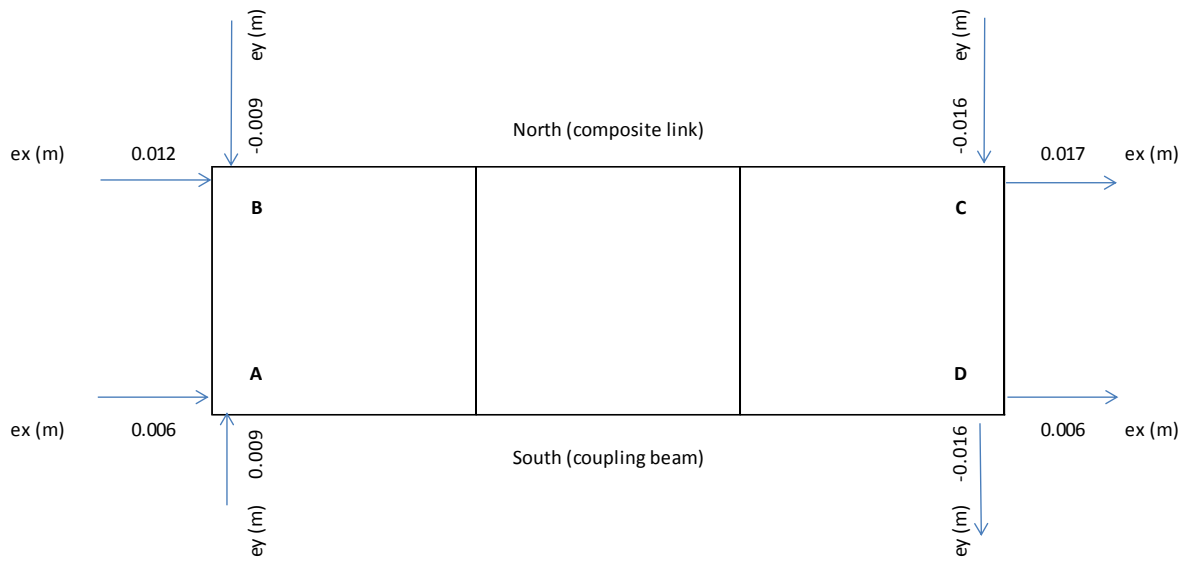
Out of plumb, 2nd measurement, 3rd floor
